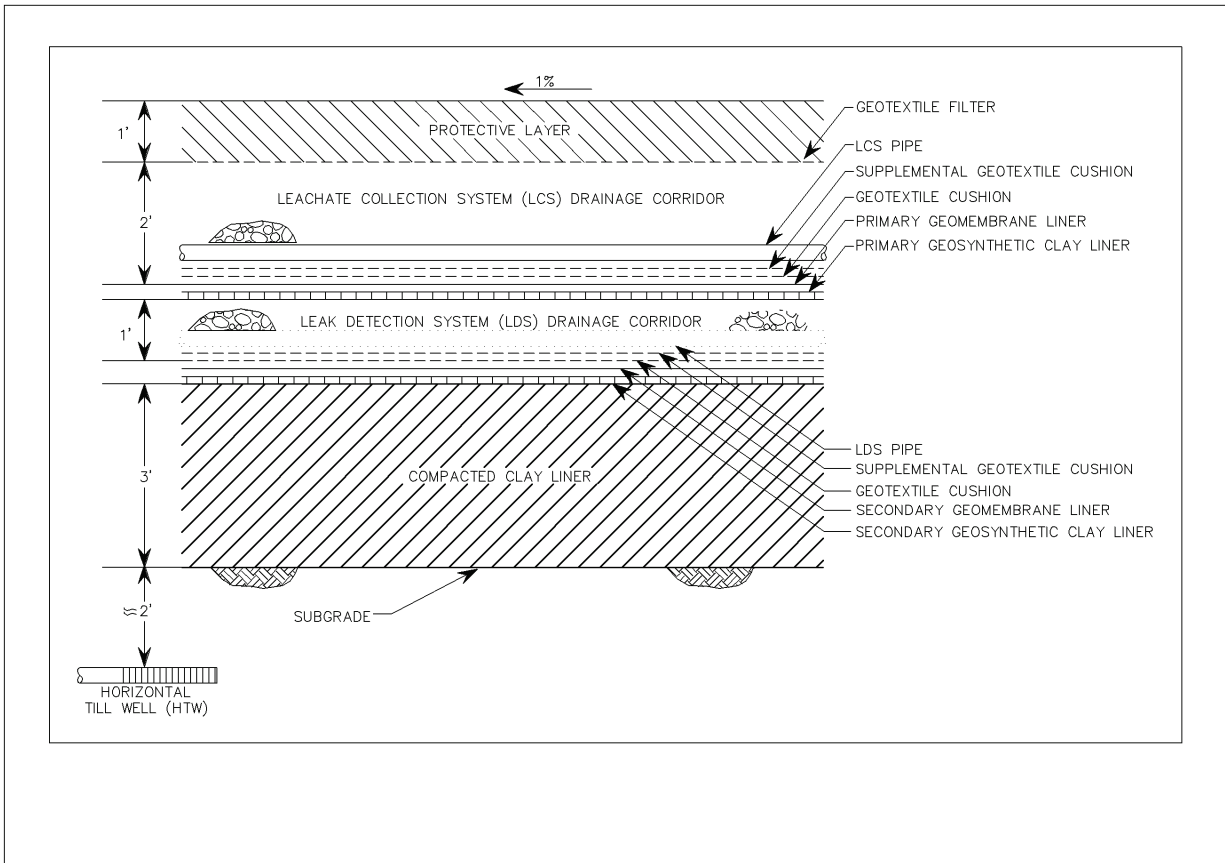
Cross Section of On-Site Disposal Facility Liner System with HTW at the Drainage Corridor
